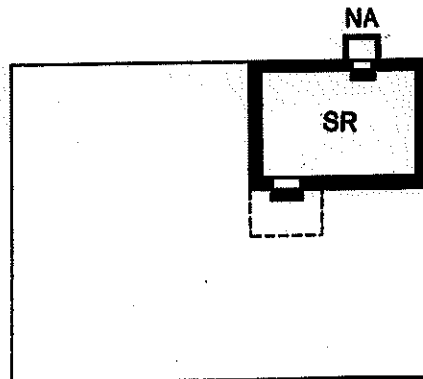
to 2-10 show the arrangement of emergency exits according to the minimum requirement given in Table 2-4.
